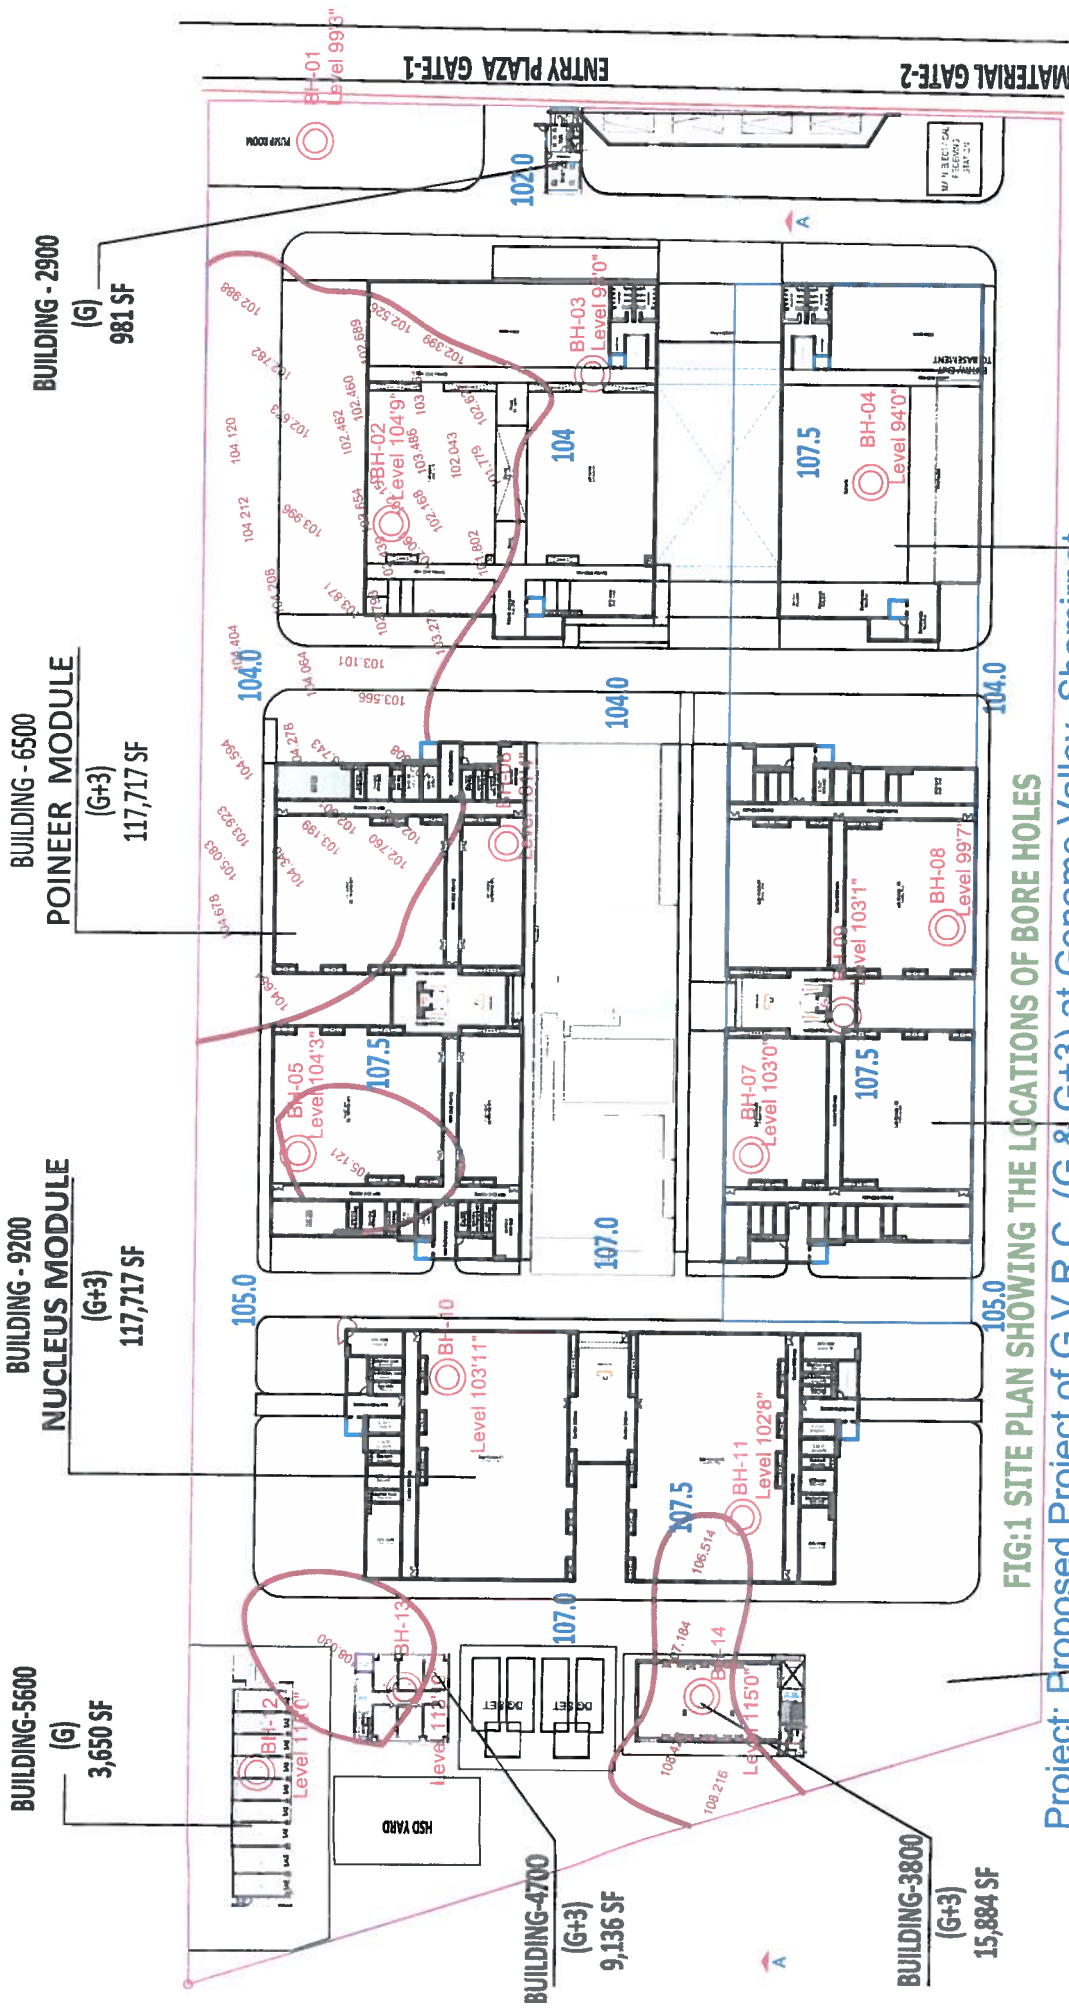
SITE PLAN SHOWING THE LOCATIONS OF BORE HOLES
